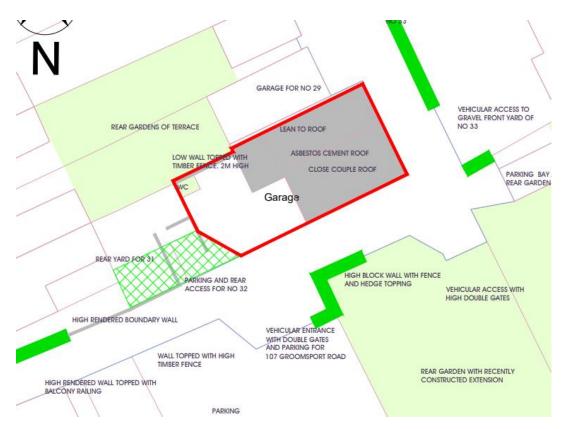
Amended Site Location Plan - right of way to the southwest and outside the application site hatched in green
